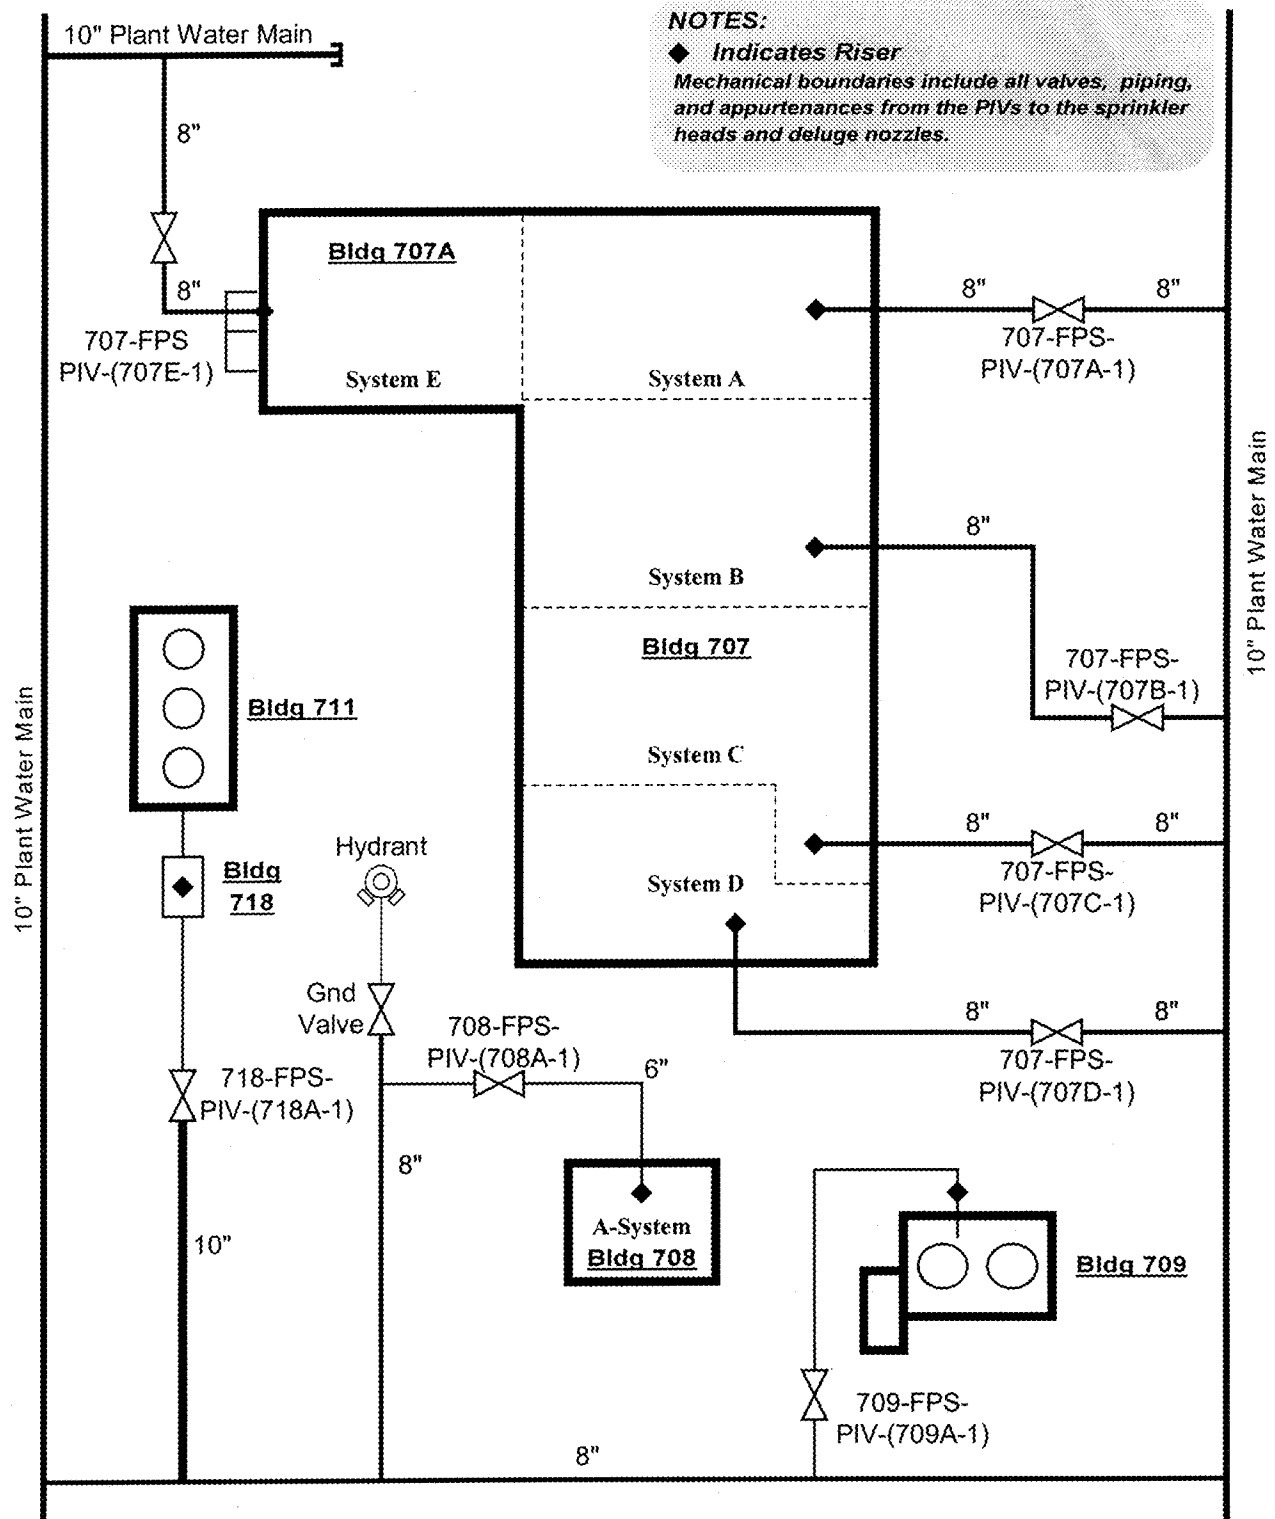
BUILDING 707/707A COMPLEX RISERS AND SPRINKLER SYSTEM
